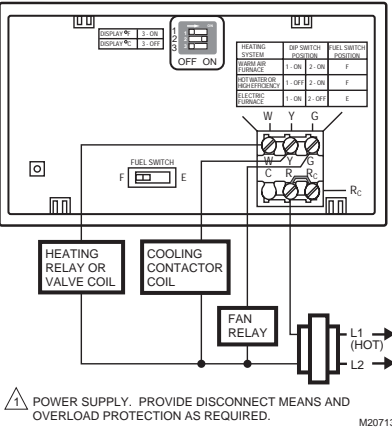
Typical hookup in four wire heat and cool (jumper intact) application.
